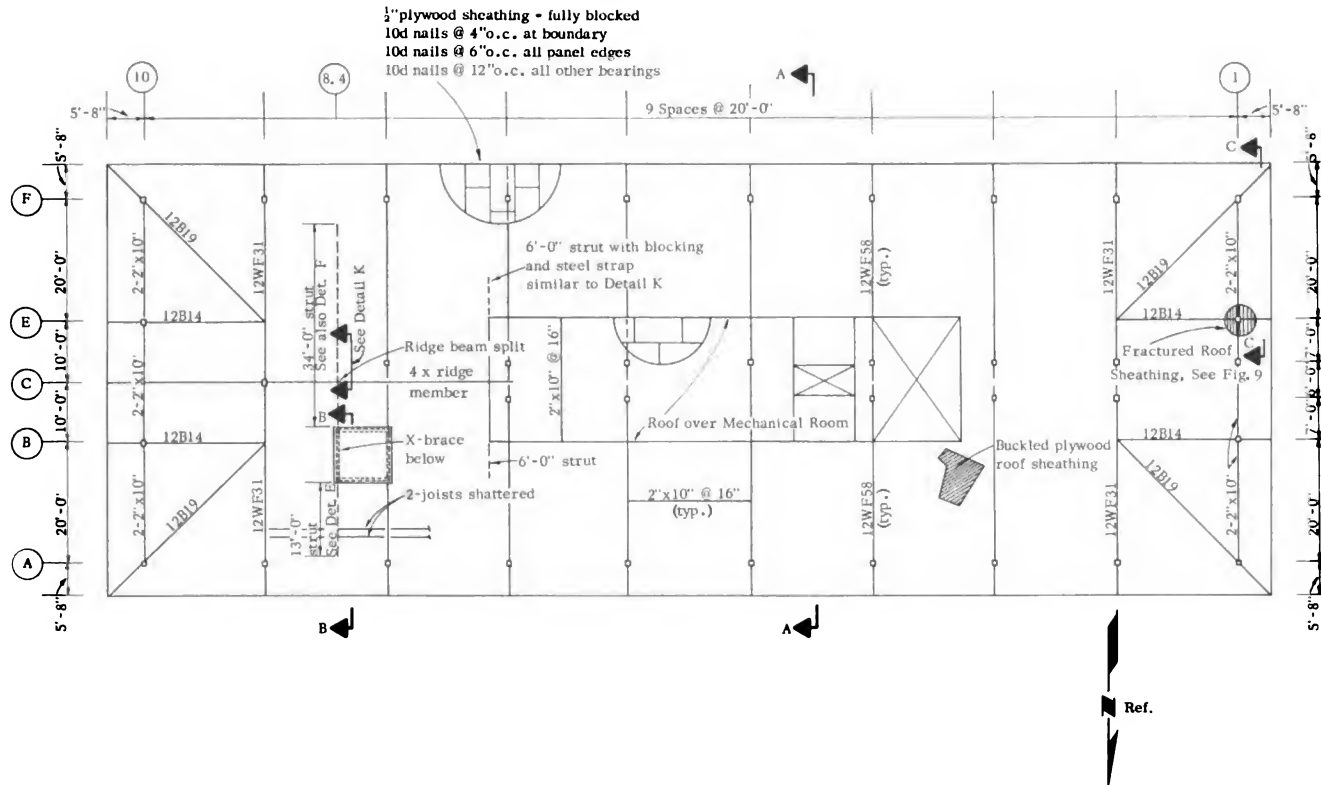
Pacoima Lutheran Medical Center. Roof framing plan.
